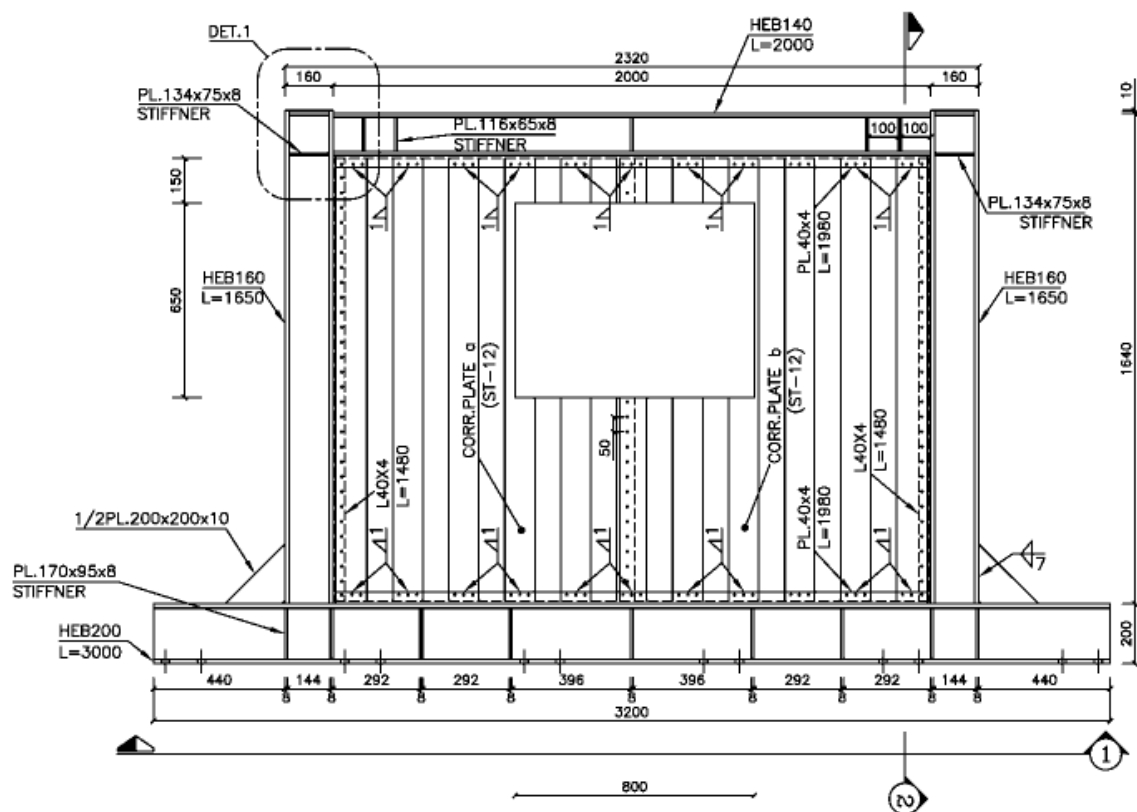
Steel shear wall with vertical trapezoidal corrugated plate and central opening [14].
